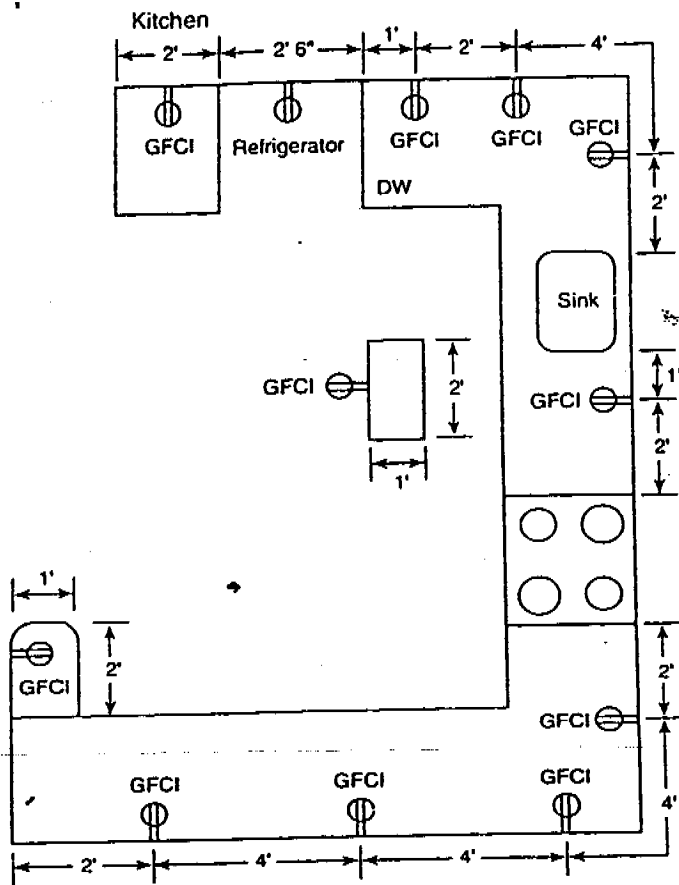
Section 210-52(c) requires a receptacle outlet at each counter space wider than 12 in., spaced so that no point along the wall line is more than 24 in. from a receptacle. Peninsular-type countertops are required to have one receptacle for the countertop. The measurement of a peninsular-type countertop is from the edge connecting to the nonpeninsular counter. A receptacle outlet is required at each island-type countertop with a short dimension of at least 12 in. and a long dimension of at least 24 in.
